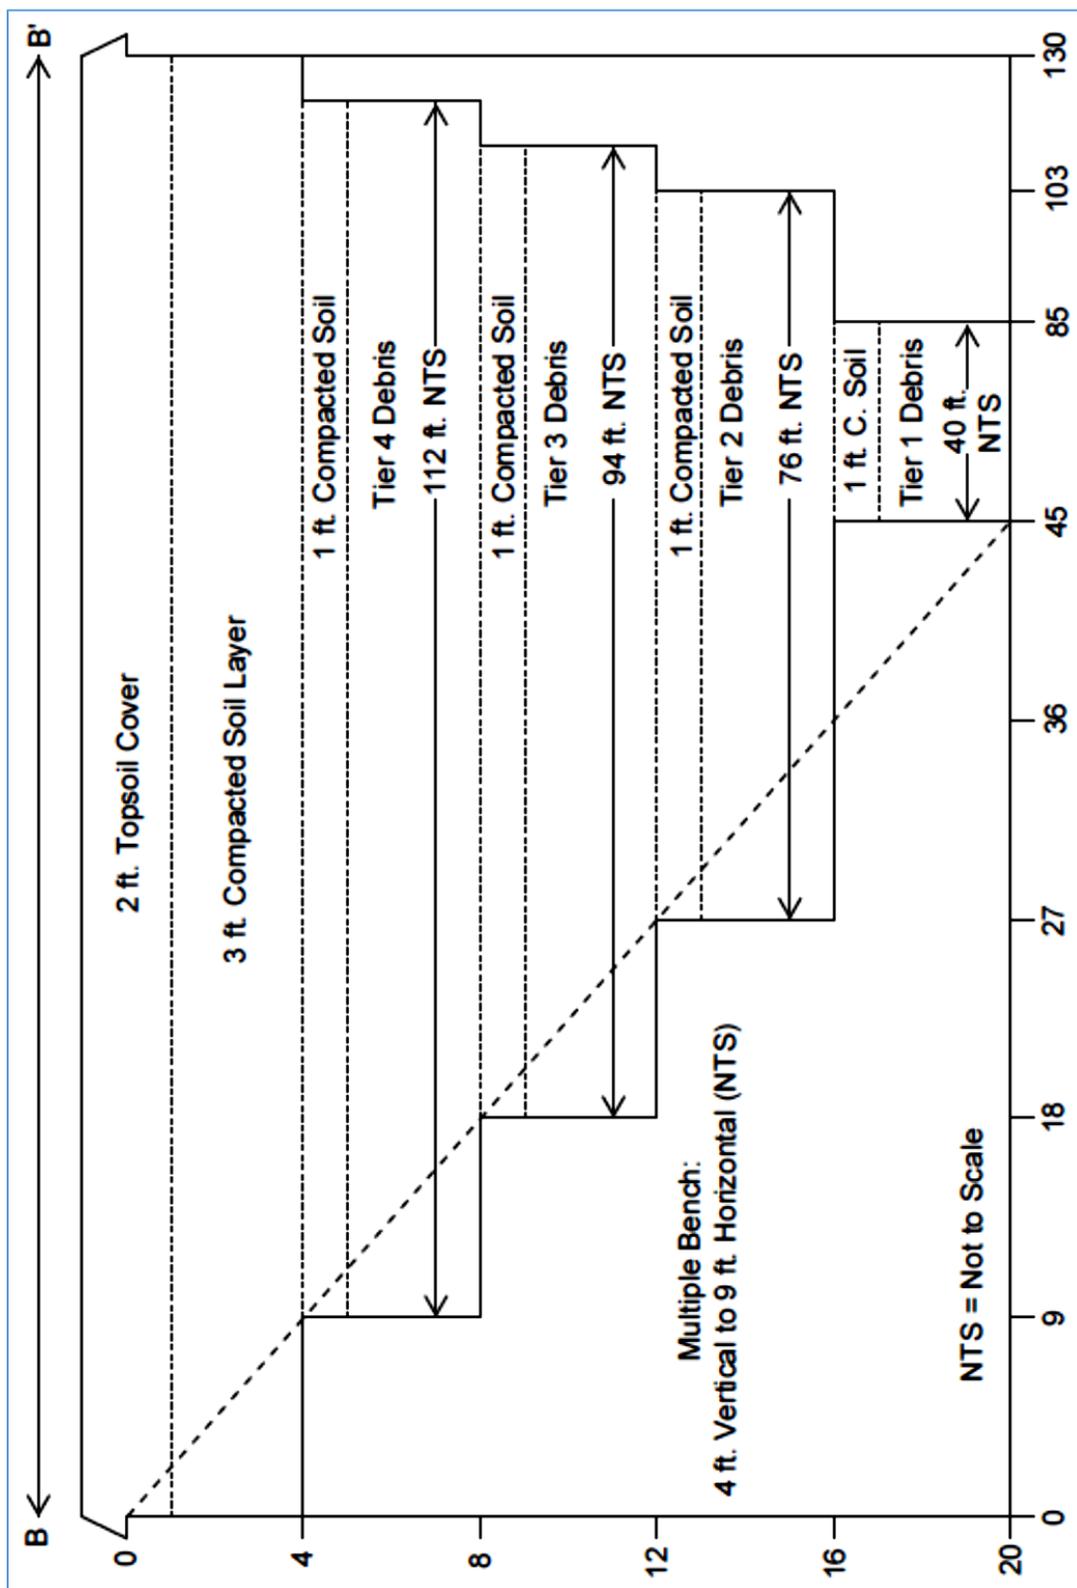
Width B – B' Cross-Section of Typical Construction Landfill Cell
